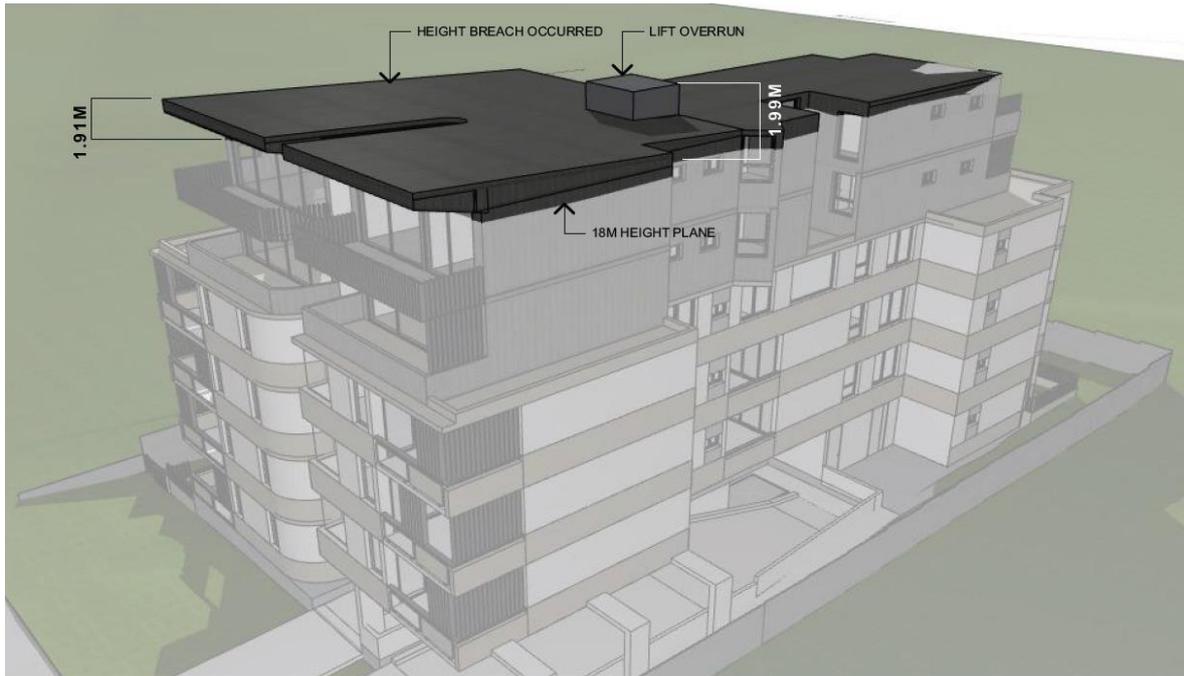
Proposed building height relative to 18m 3D height plane (Extract from Architectural Plan A1401 Section AA)
